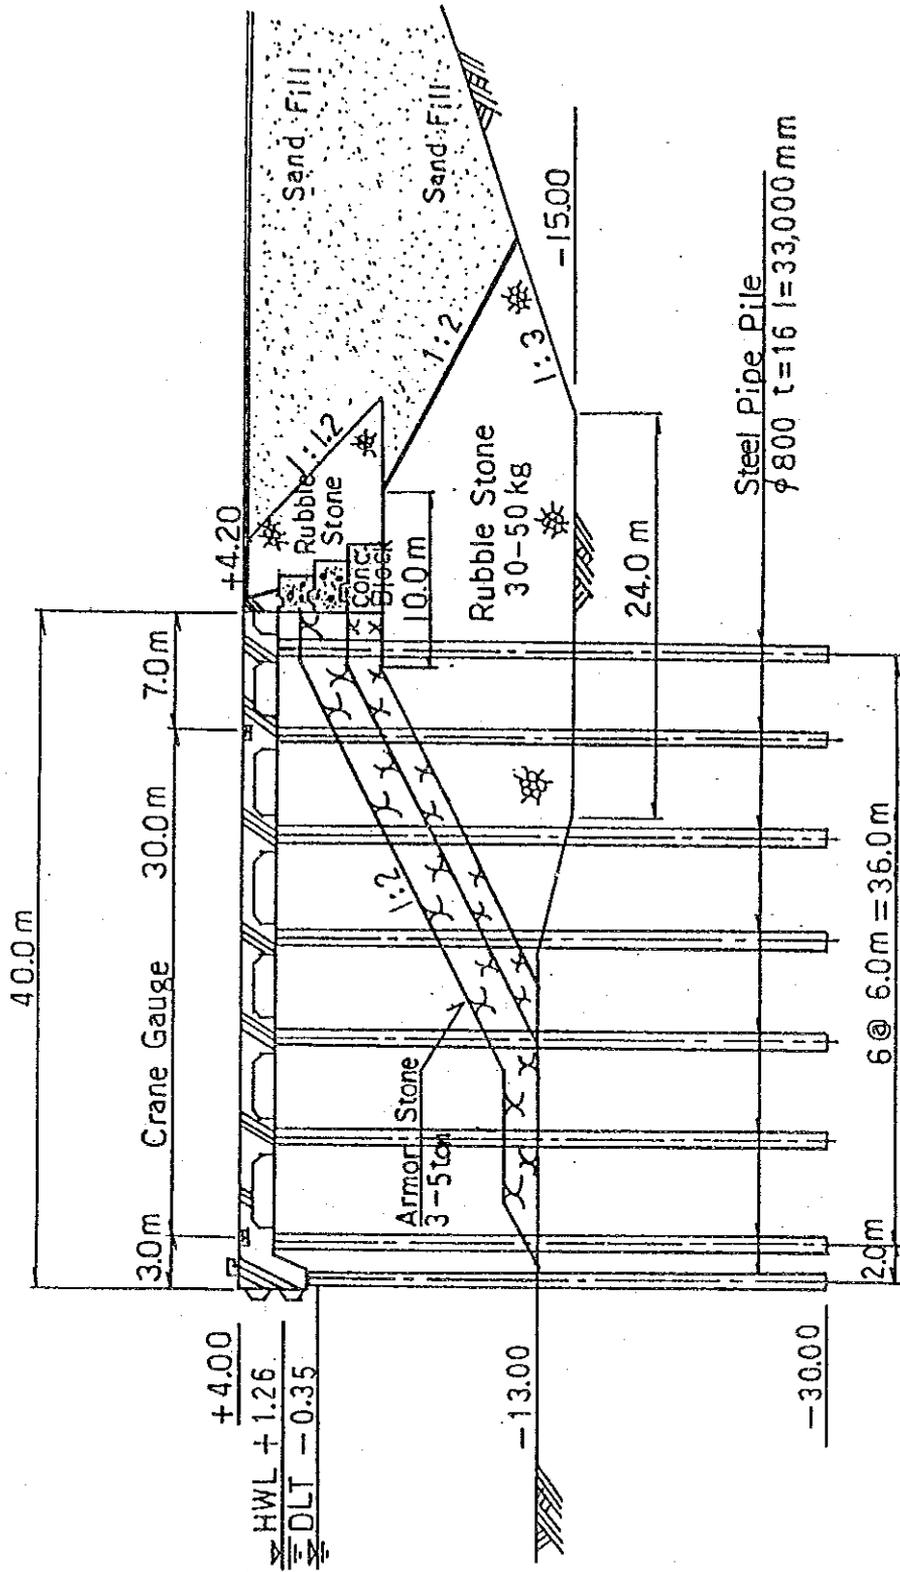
Typical Cross Section of -13m Container Berth at MICT
